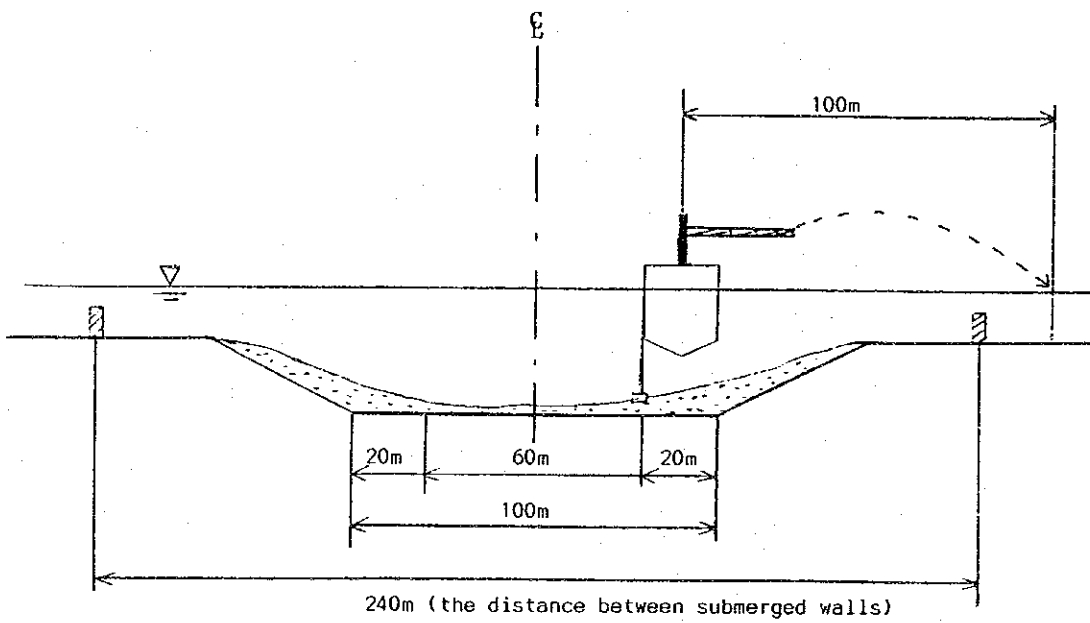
Image of Side-casting with Submerged Walls
